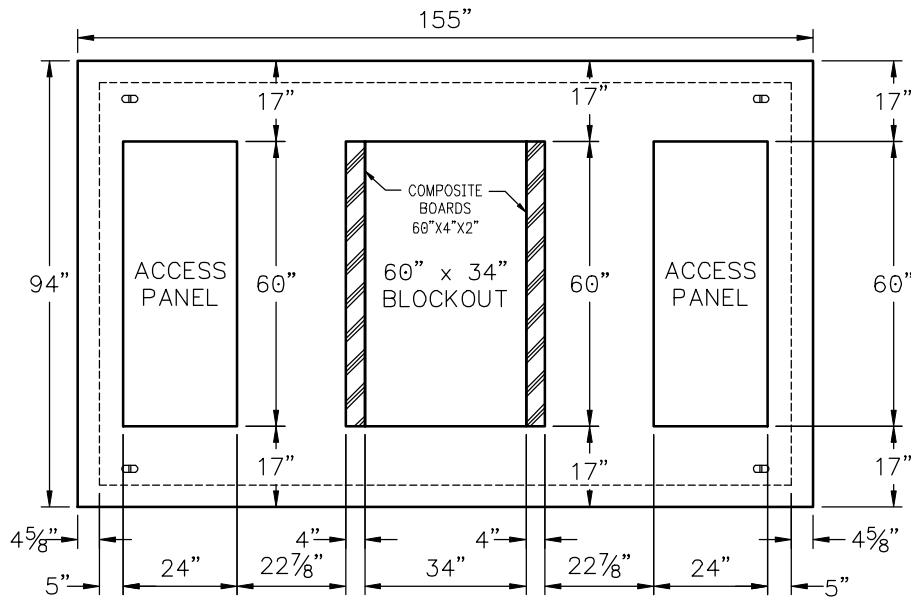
Padvault Pad Layout (SI# 7992790) for 15/25 kV, 600-Amp Type-3 Switchgear with 1000kcmil cable
